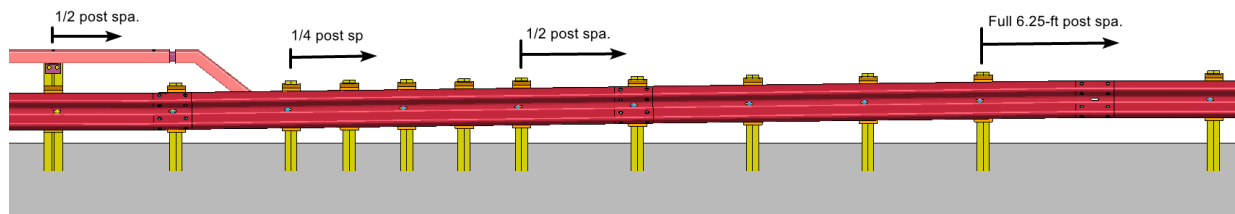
Transition Design with Posts Installed at Quarter and Half Post Spacings.
